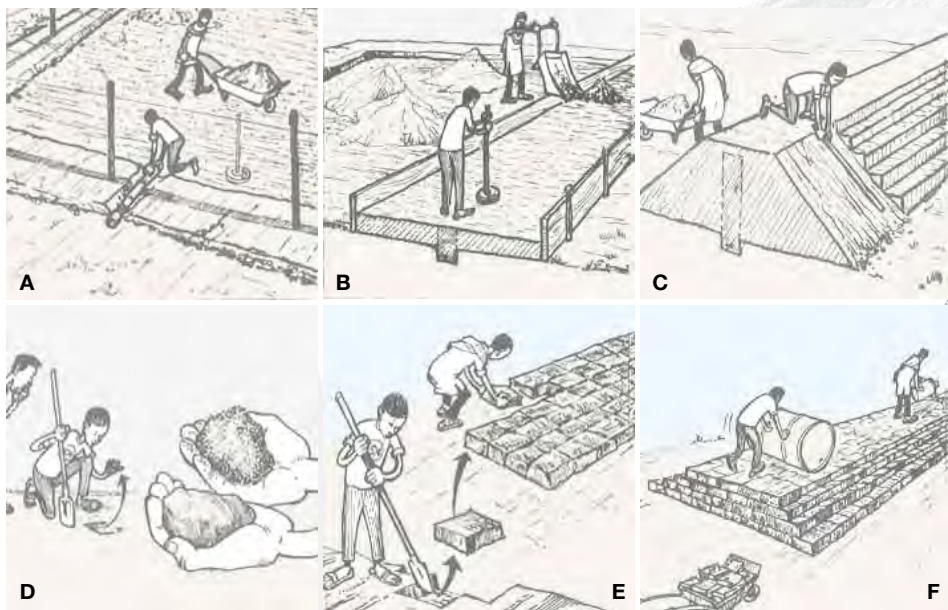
Dike construction (I). A, B and C: Traditional; D, E and F: Block construction
